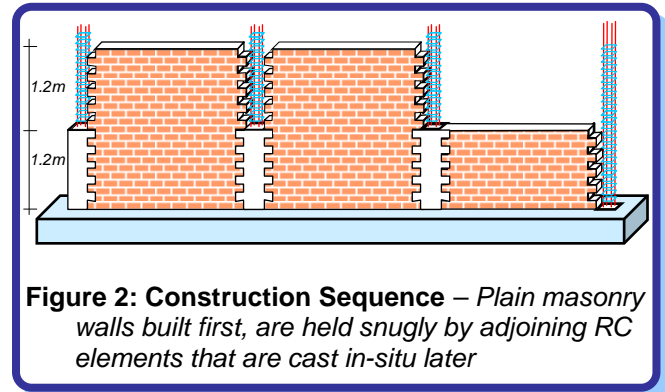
Construction Sequence – Plain masonry walls built first, are held snugly by adjoining RC elements that are cast in-situ later
